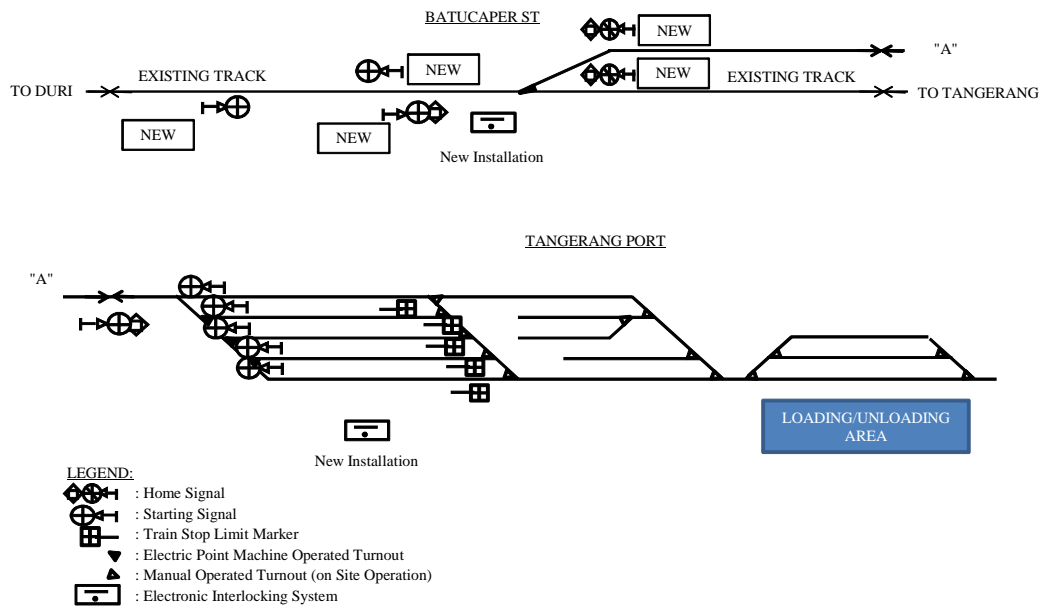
Signalling System Layout (Railway Access to Tangerang New Terminal)
